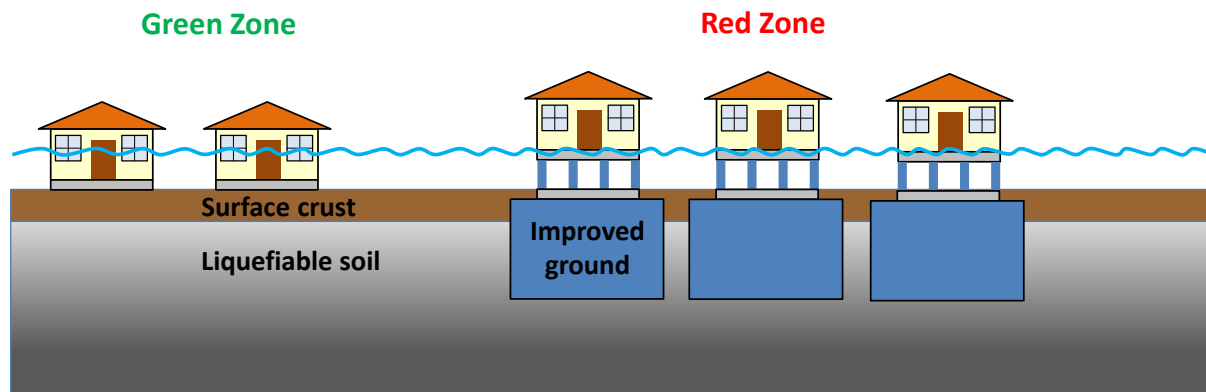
Concept 3 - Elevated dwellings with ground improvement & surface-structure foundations. Light blue line is 200 year flood level.
